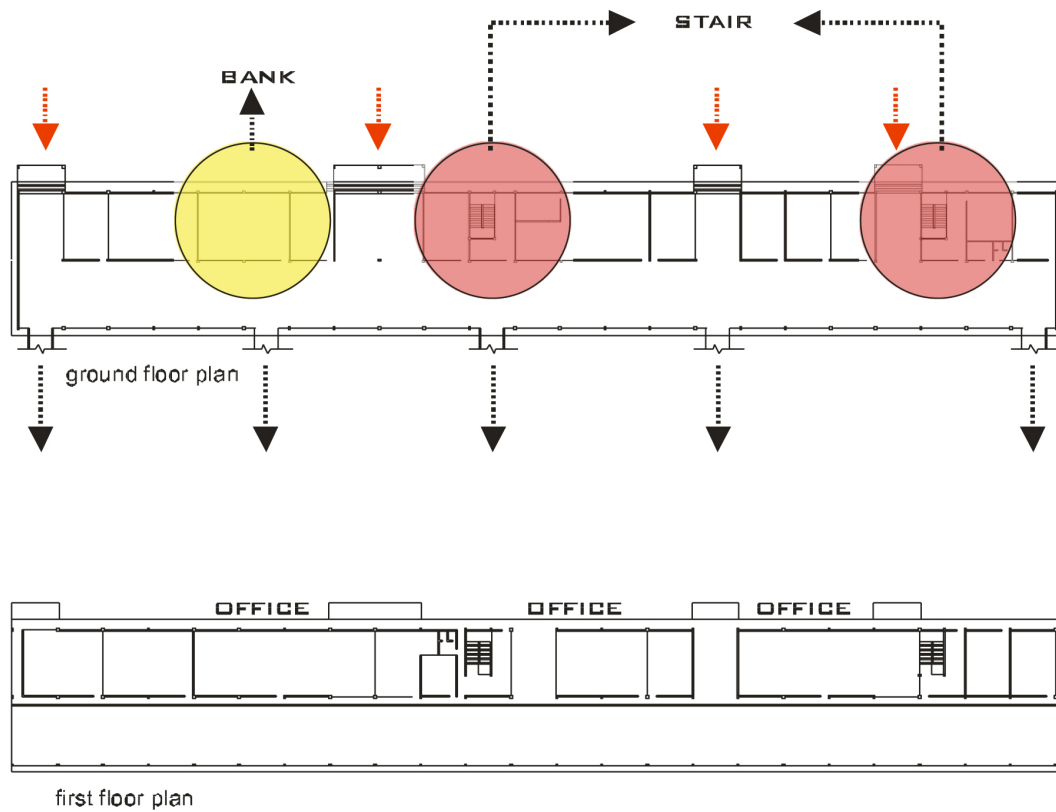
Plans of Sadarghat Launch Terminal [building]
